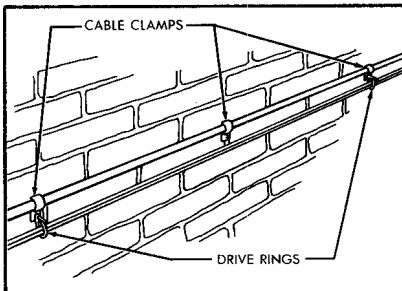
Drive Ring or Bridle Ring Run Paralleling Cable Attached with Cable Clamps
